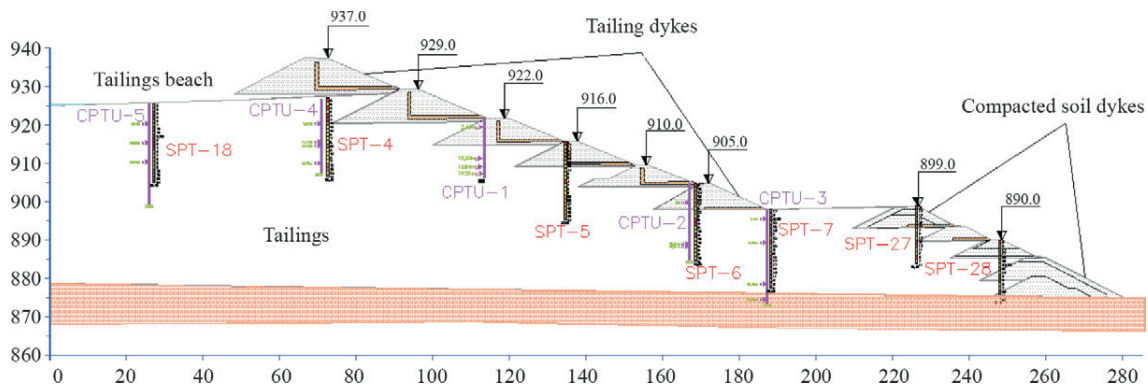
Typical cross-section of the dam (RS section) and SPT and CPT locations.
